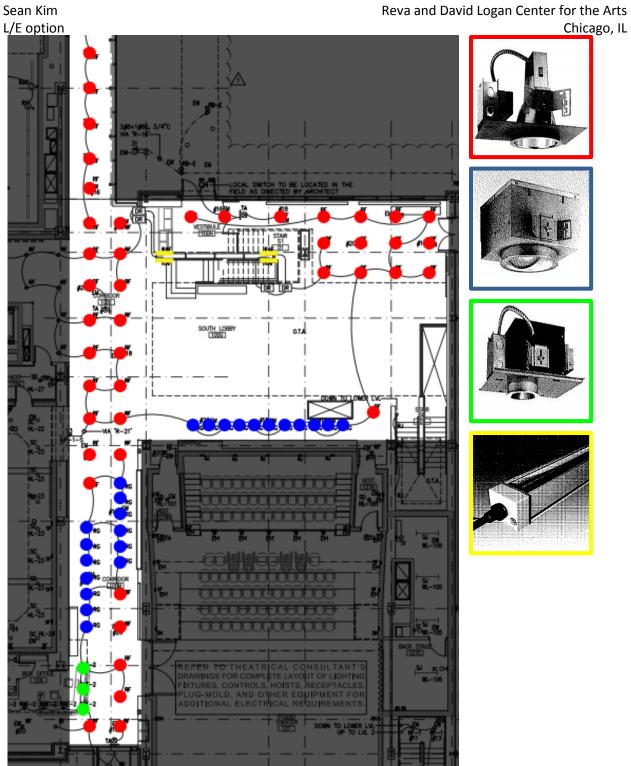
Main Lobby Reflected Ceiling Plan - South Portion
